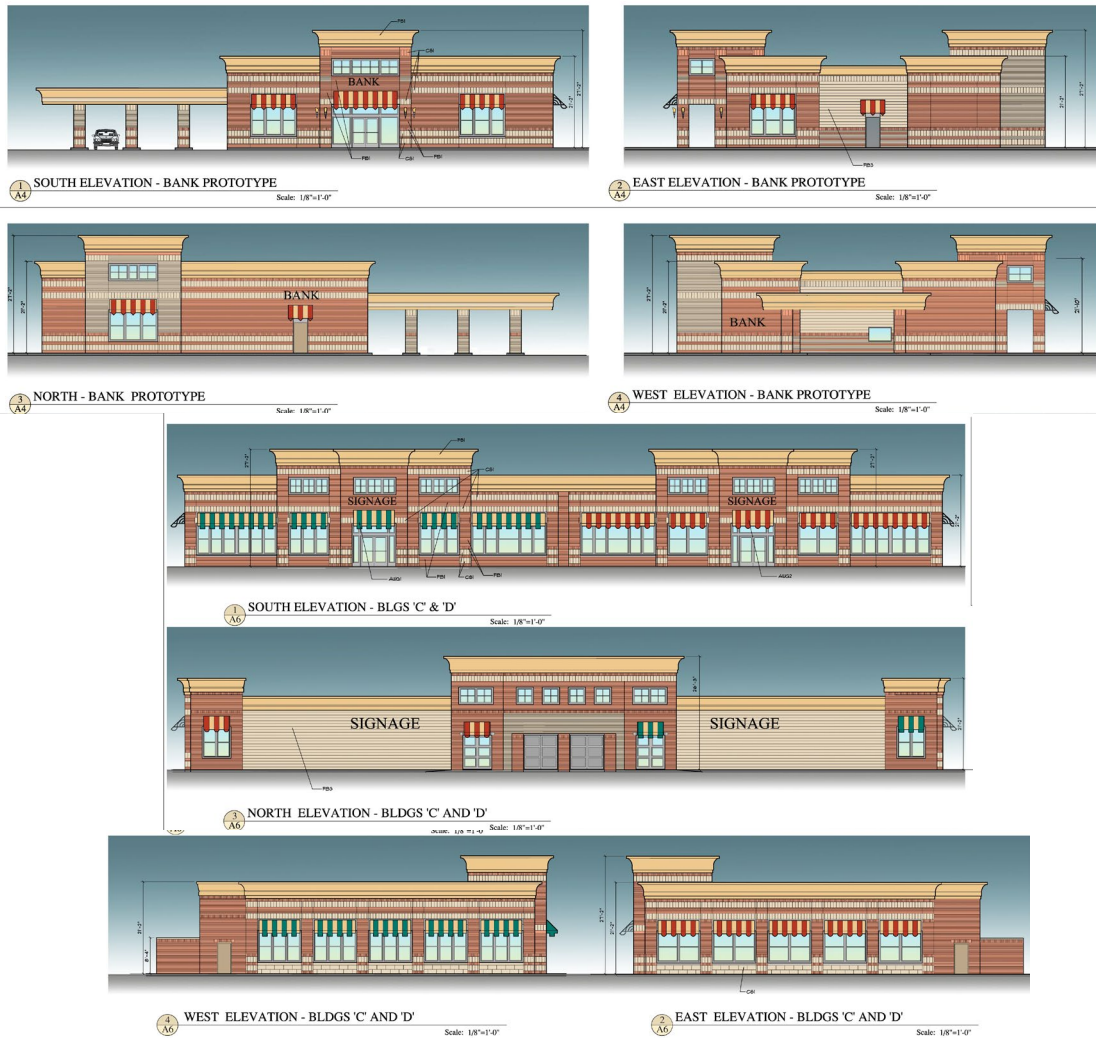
Front, Rear and Side Architectural Elevations of the Pad Sites
